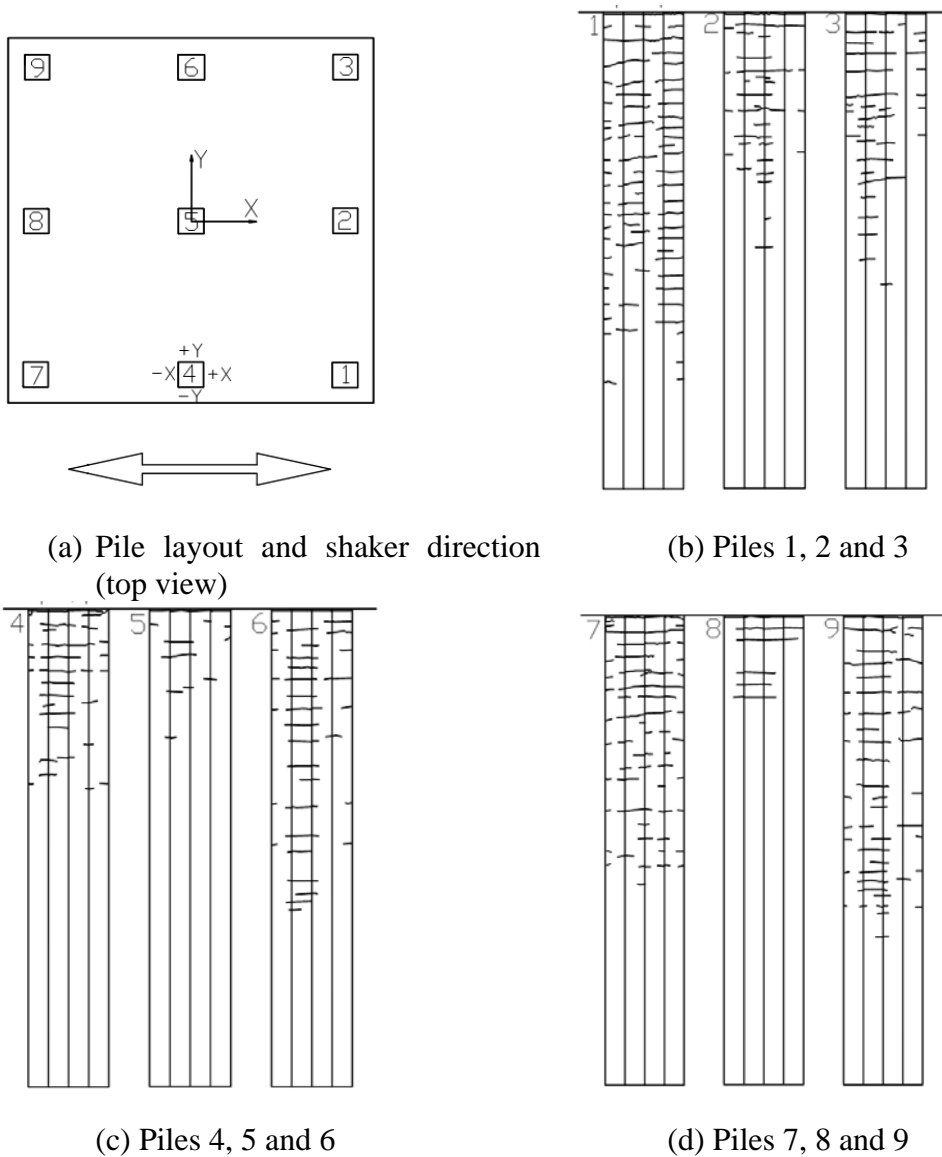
Layout of the pile foundation and cracks on the piles visually inspected after the shaker tests.
